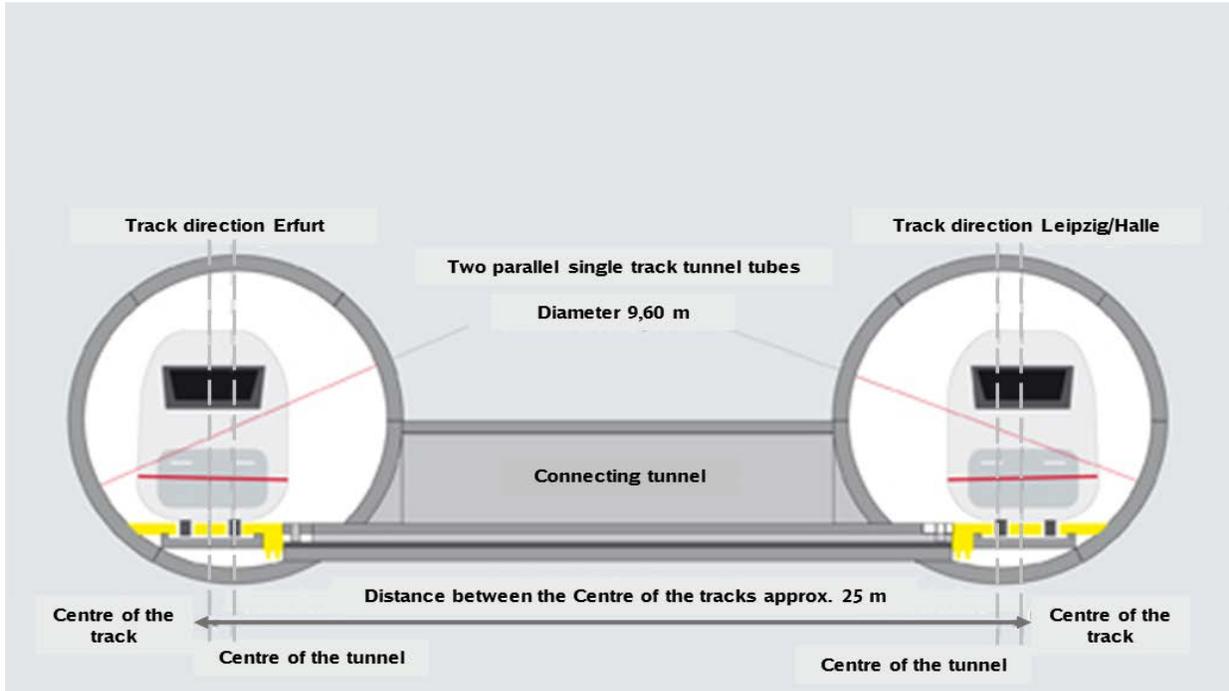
Finne Tunnel – typical tunnel cross section - Source: DB AG
